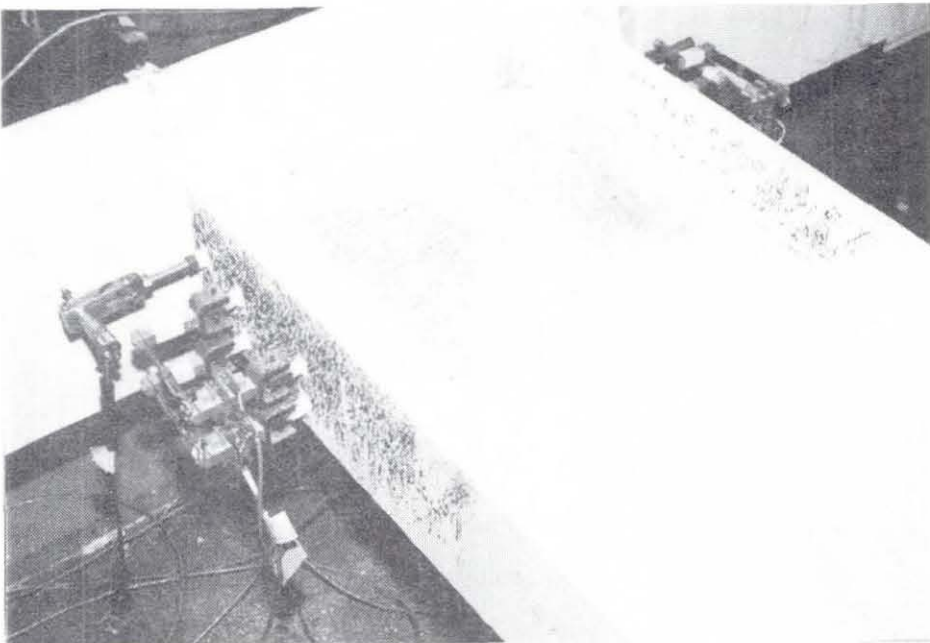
Flaking of Whitewash on Beam Flange and Web (Specimen 9)
